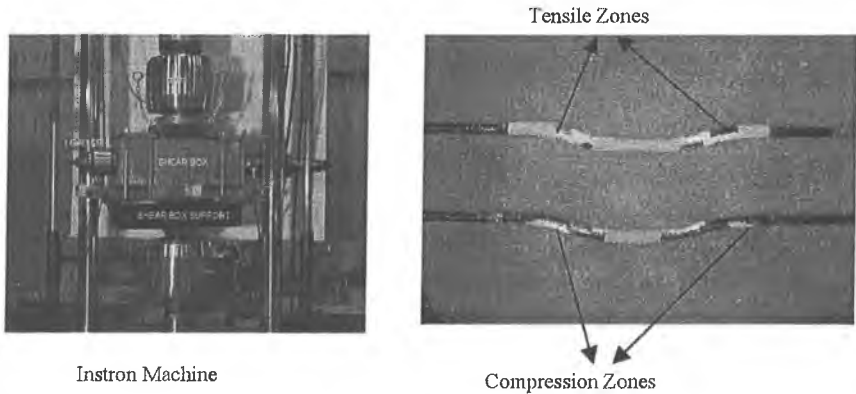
Photograph of tested sample in Instron testing machine and sketch of deformed bolt together with a post testing deformed bolt
